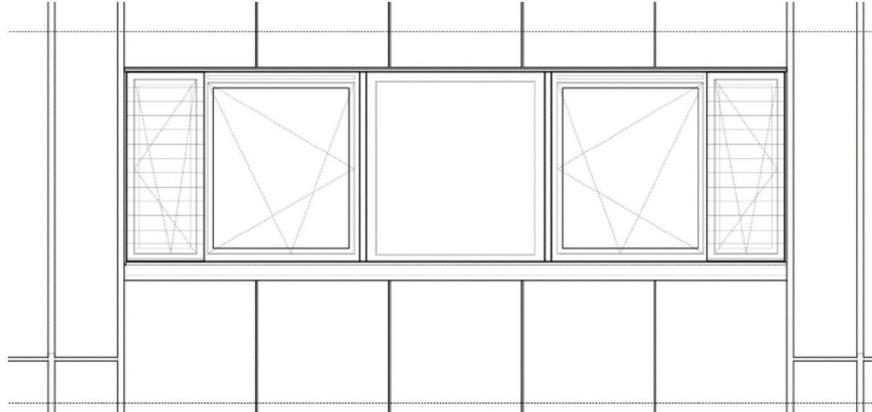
Extract from Studio E Drawing 1279 (06) 110 00 'Proposed Typical Bay Plans, Section & Elevation' {SEA00002499}
